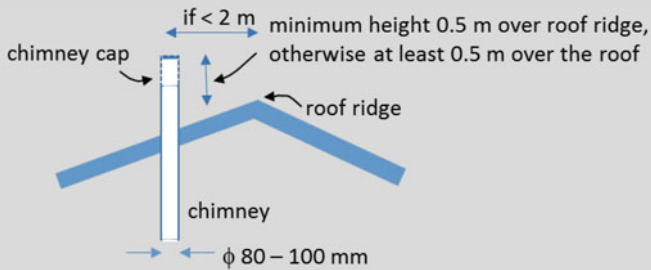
Each biomass stove must have a separate chimney, which must be higher than the roof ridge; values are indicative; for details, the technical manual and local legislation must be checked
